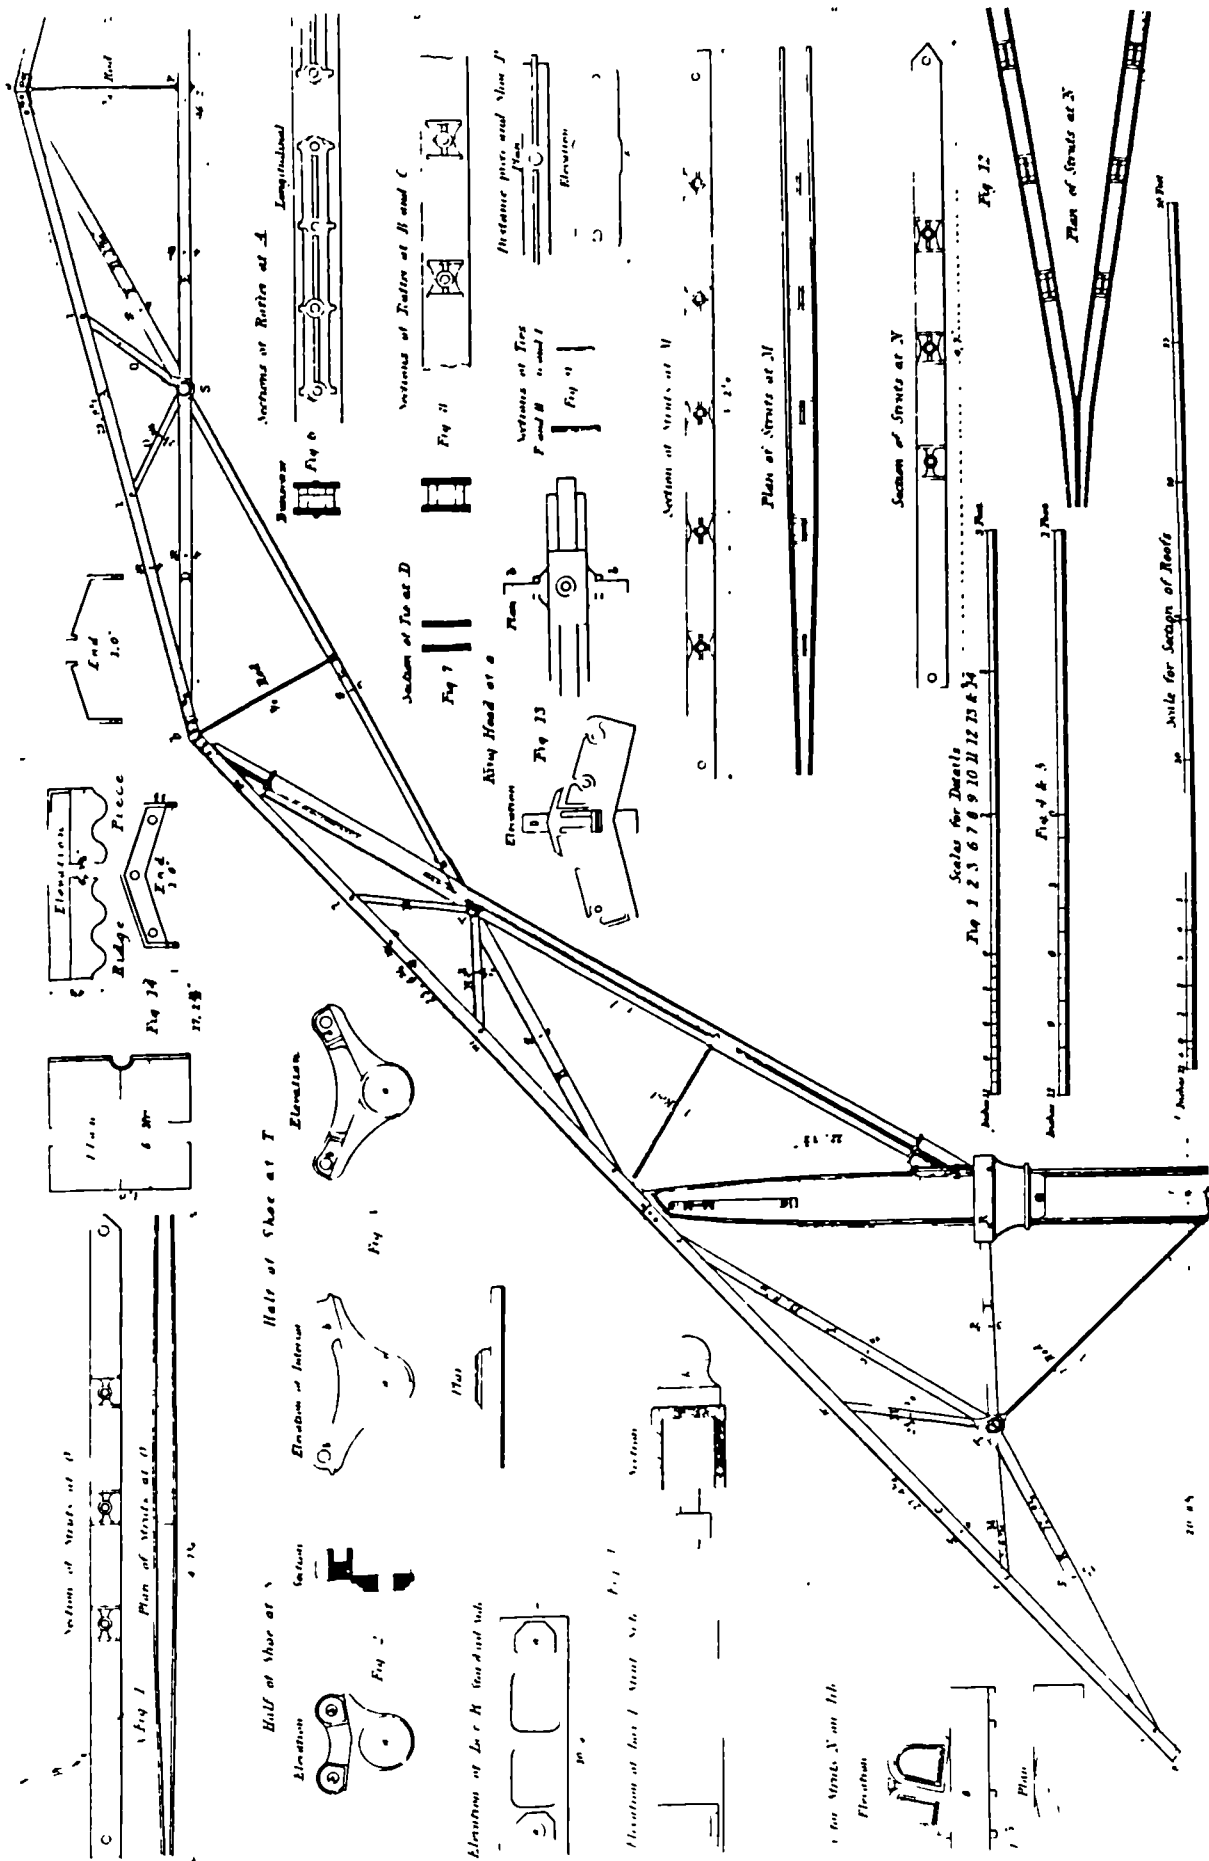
Slip Roof Nos. 8 & 9, Pembroke, 1844-45 : Details
